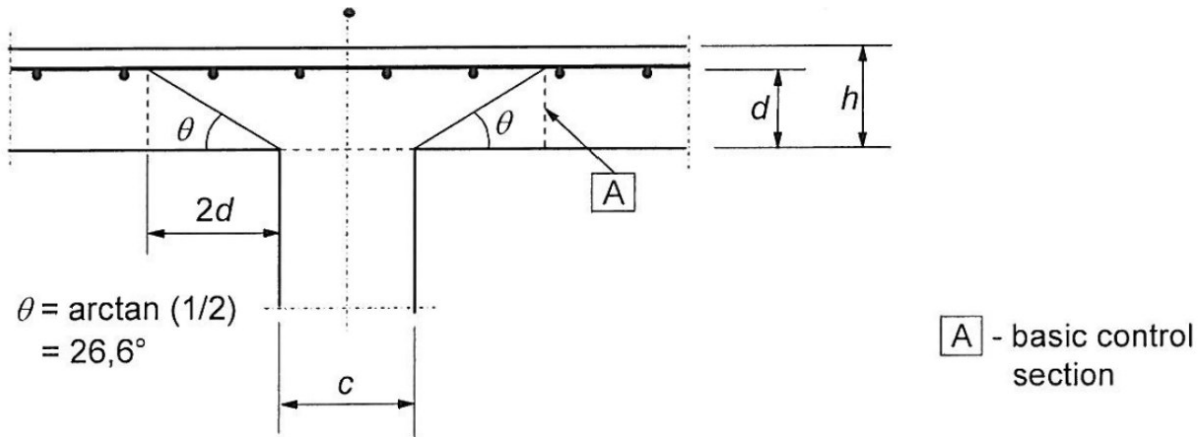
Punching shear failure with truncated cone and failure cracks (Sørensen & Øverli, 2013, p. 130).
